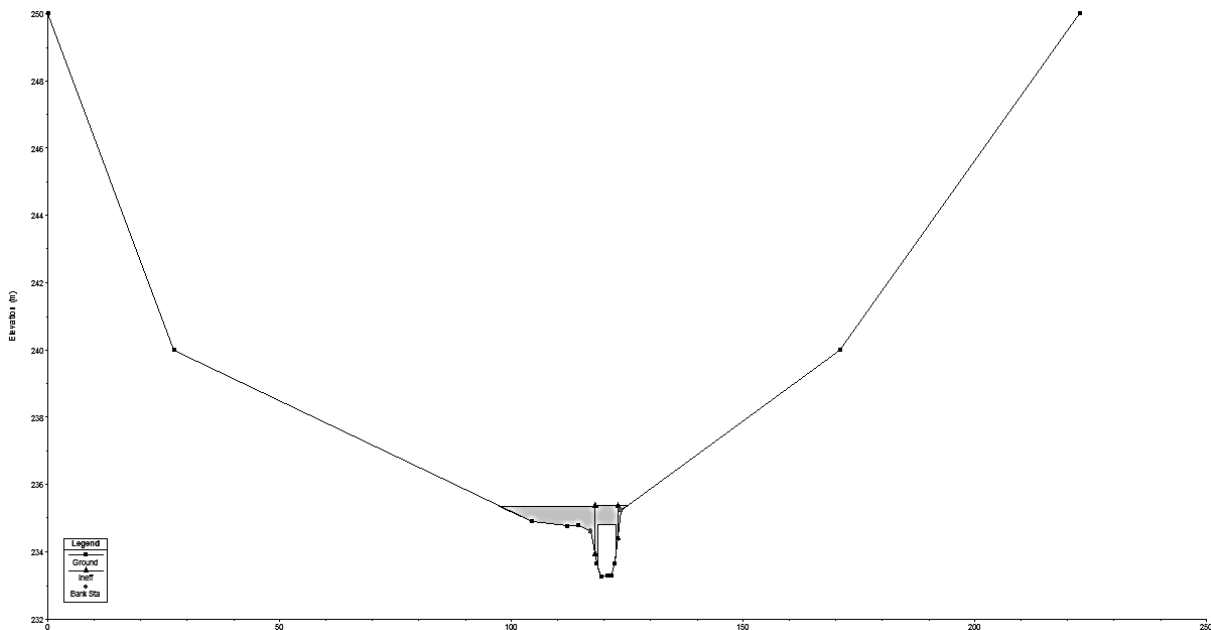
Cross section of reconstructed bridge (Hec-Ras)
